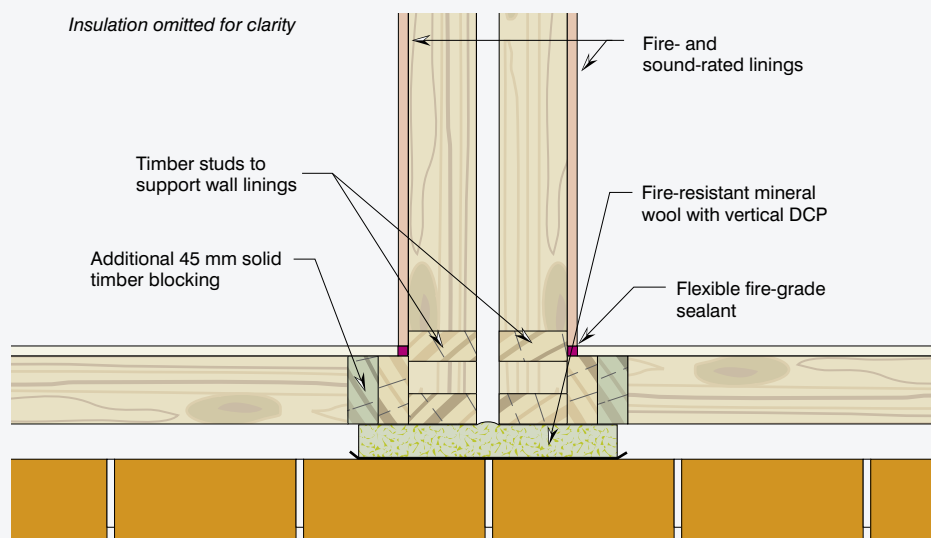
Fire-resistant mineral wool in brick veneer cavity – plan view.
